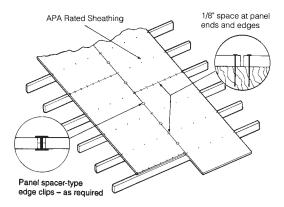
Proper installation of APA-rated sheathing for roof applications.
